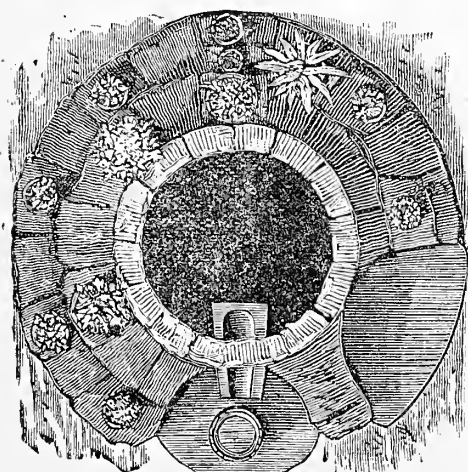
VIEW OF CURB LOOKING DOWN.
